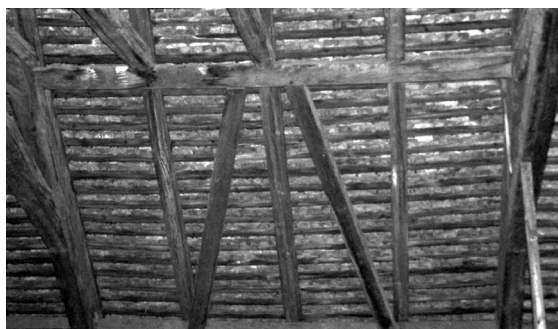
a. – Roof structure of house on Kogălniceanu street no. 6, Cluj-Napoca – „classic” longitudinal bracing system, form Λ
